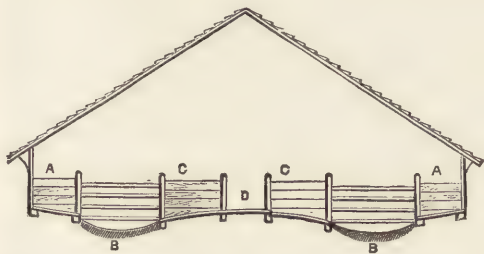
Construction of Pig-Pen—A A, Sleeping Apartments, 5 feet wide, 5 inches fall; B B, Manure Depressions, 8 feet wide, 1 foot deep, with lifting gates; C C, Feeding Floors, 5 feet wide; D, Entry or Centre Alley, 4 feet wide. Partitions are 3 feet high; Entire width, as above represented for double tier of pens, 40 feet.
